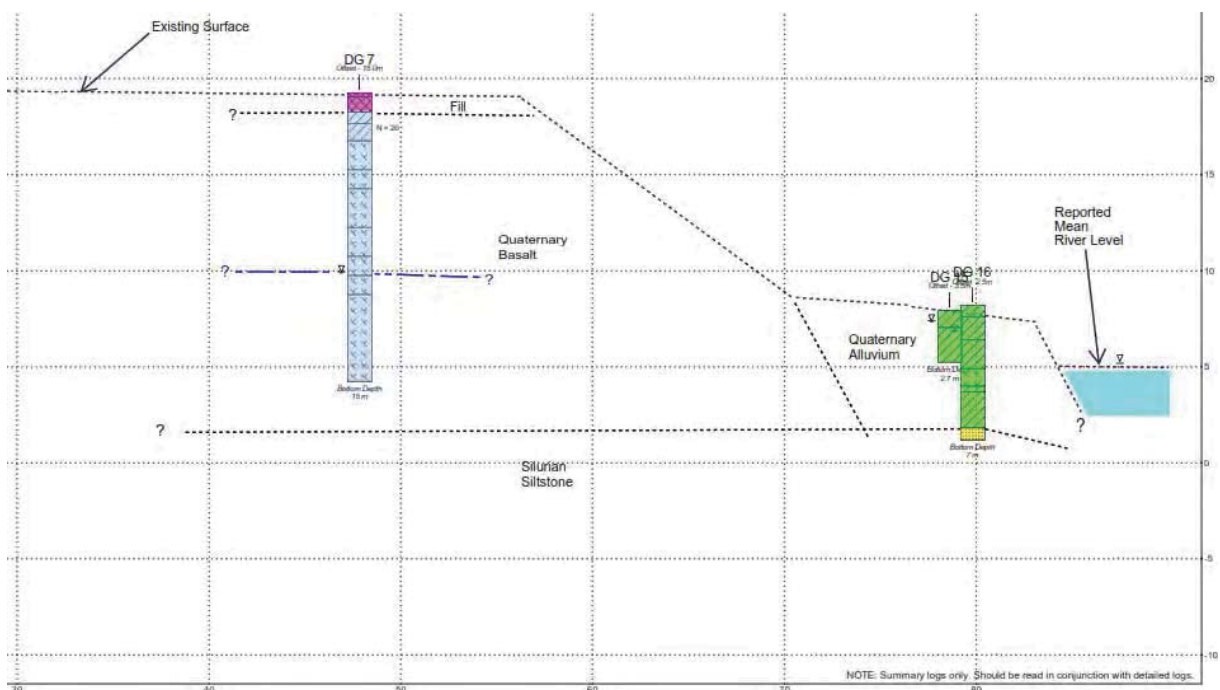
Cross Section C-2 Extract (see Appendix B for full cross section drawing)
